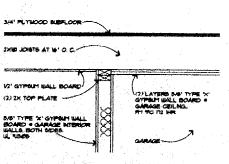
ND FLOOR AT EXTERIOR SCALE: 1' - 1'-0'
